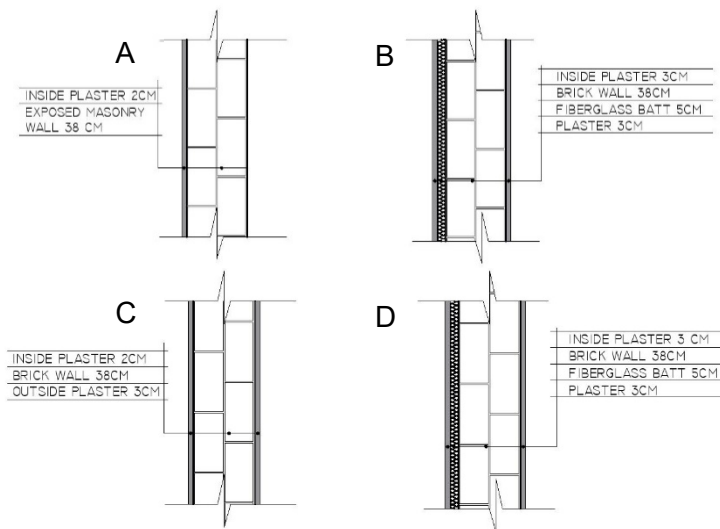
Details of the existing wall in Tirana (A) and Shkodra (C) and the proposed new walls in Tirana (B) and Shkodra (D) (source: the authors, extracted from the AutoCAD software, 2021)
